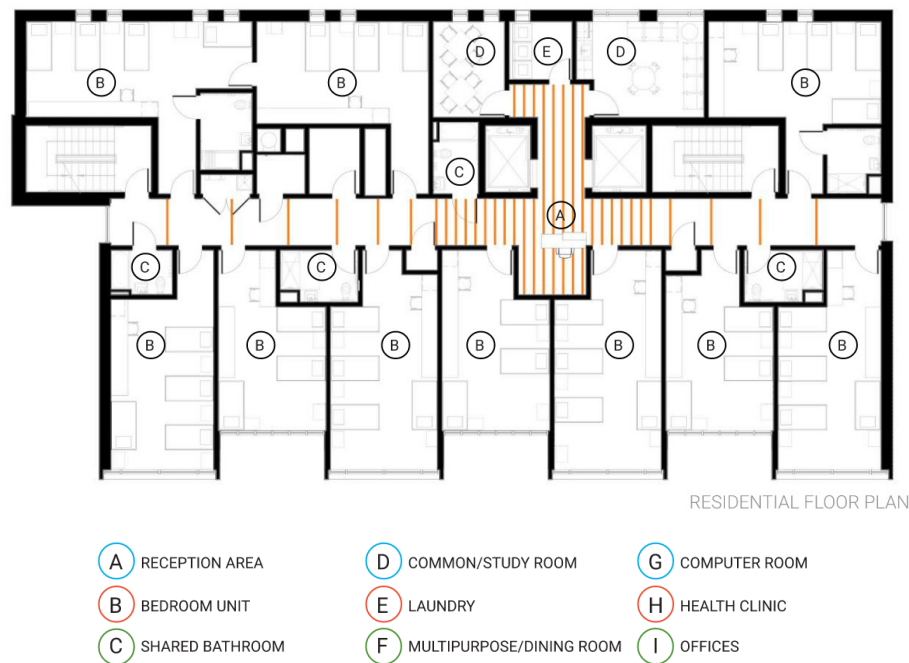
Final residential floor plans; Source: CS-A Final Presentation Document
